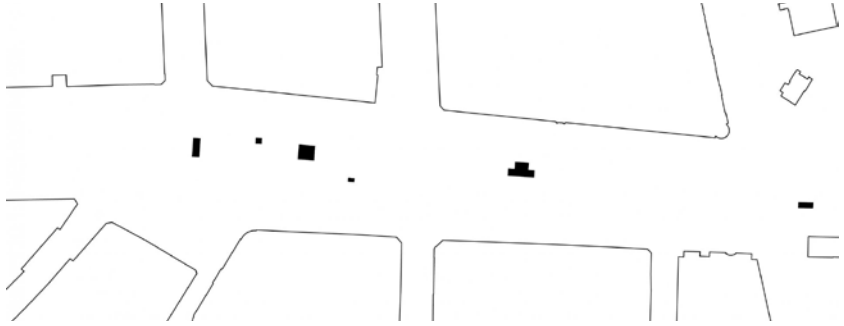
The fixed elements of the Nørreport station - stairs and elevators
